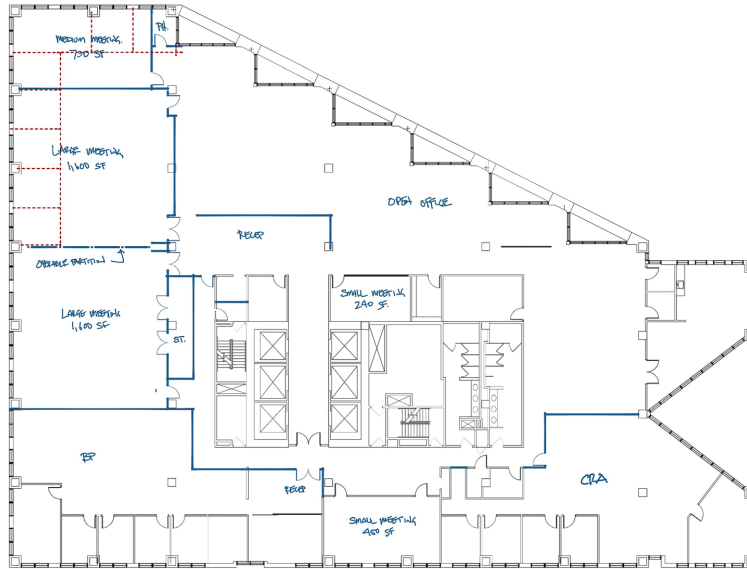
Office Floor Plate Conceptual Layout Alternatives
